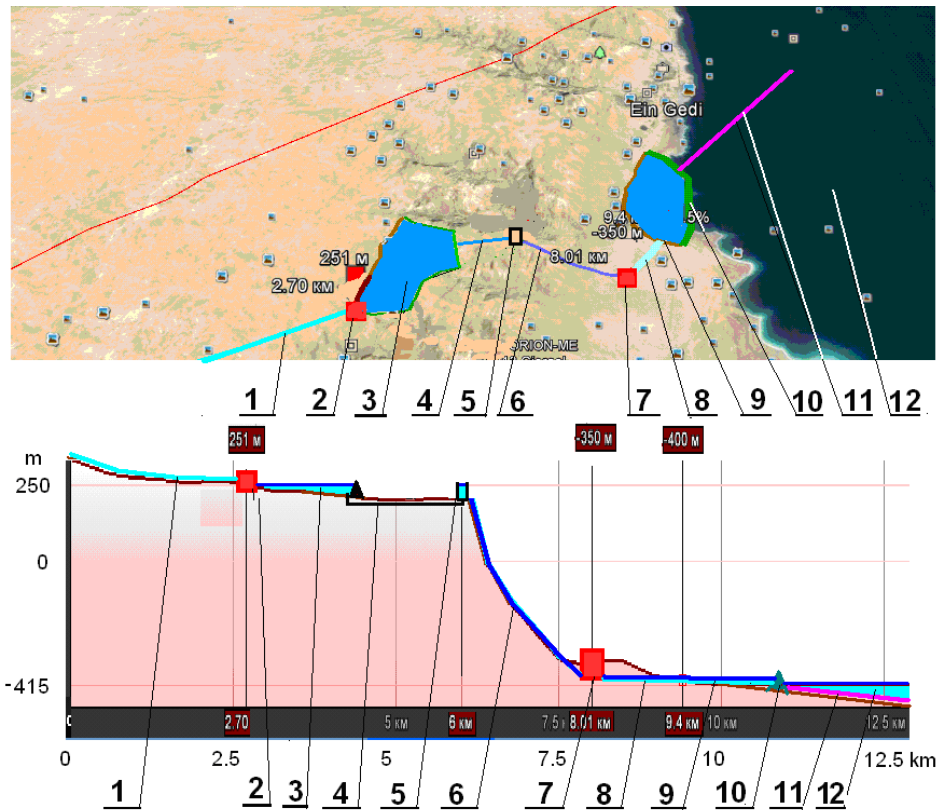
Plan of the PSP: 1 – route of the conduit; 2 – dam-less hydroelectric plant; 3 – upper reservoir; 4 – siphon; 5 – collector; 6 – penstock; 7 – pumped-storage hydroelectric plant; 8 – open
